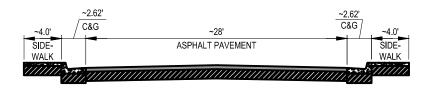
EXISTING GENERAL STILWELL STREET TYPICAL SECTION
